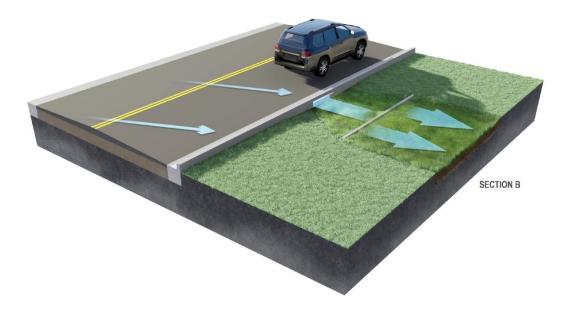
Application 3, Pavement draining through a single curb opening to PIA
